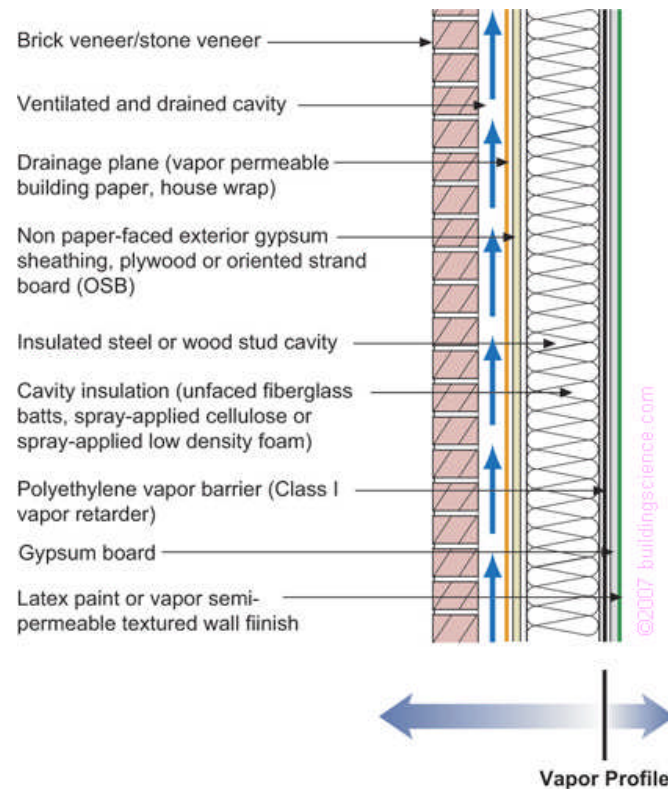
Frame Wall With Cavity Insulation and Brick or Stone Veneer With Interior Vapor Barrier
